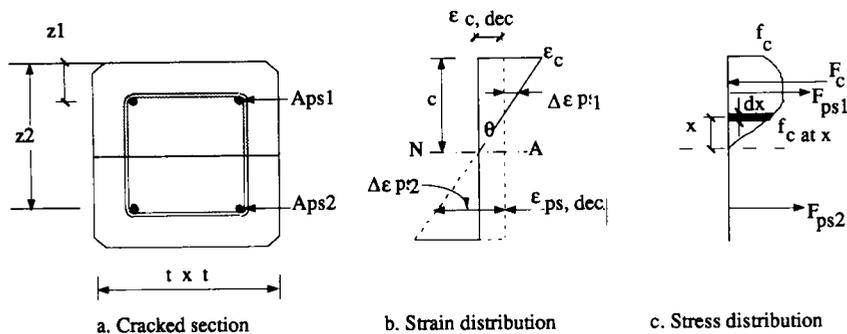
Properties of prestressed cracked pile section.
